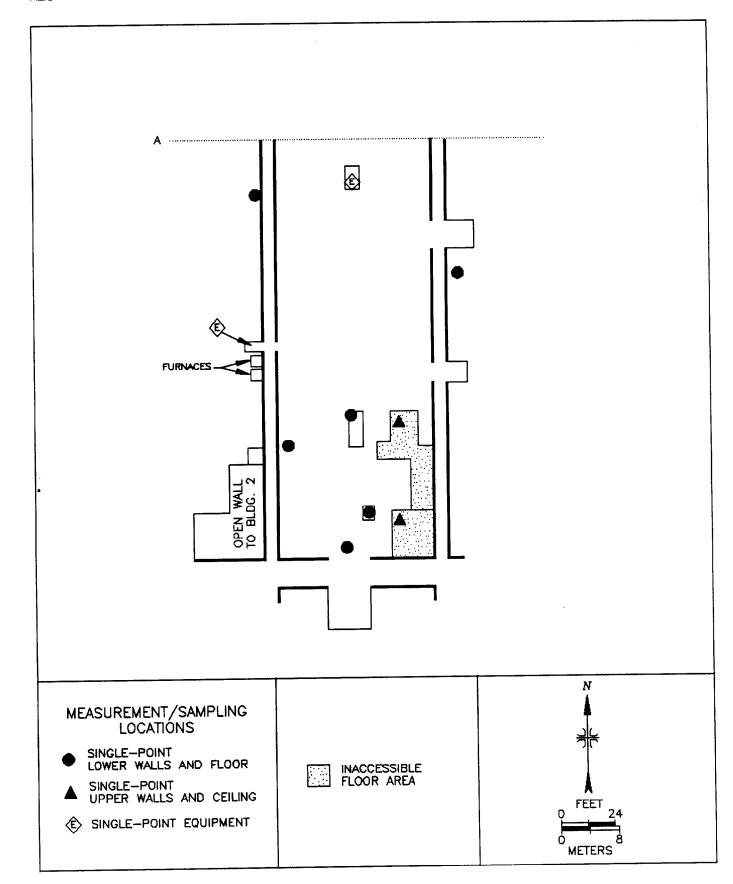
Building 1, Section A — Measurement and Sampling Locations
